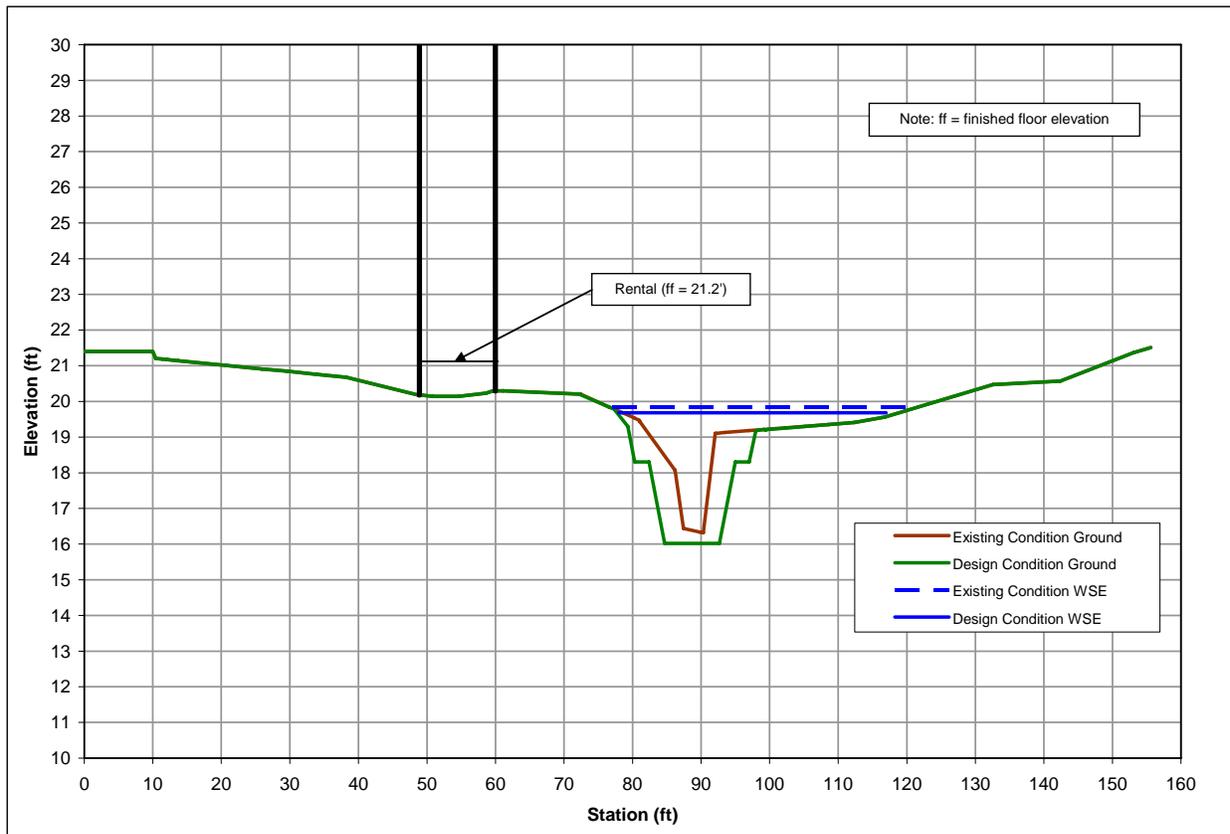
Cross-section 5905 showing existing and design condition water surface elevations (WSE) at 5-yr flood ($Q_5 = 201\text{cfs}$). See Figure 10 for cross section locations.
